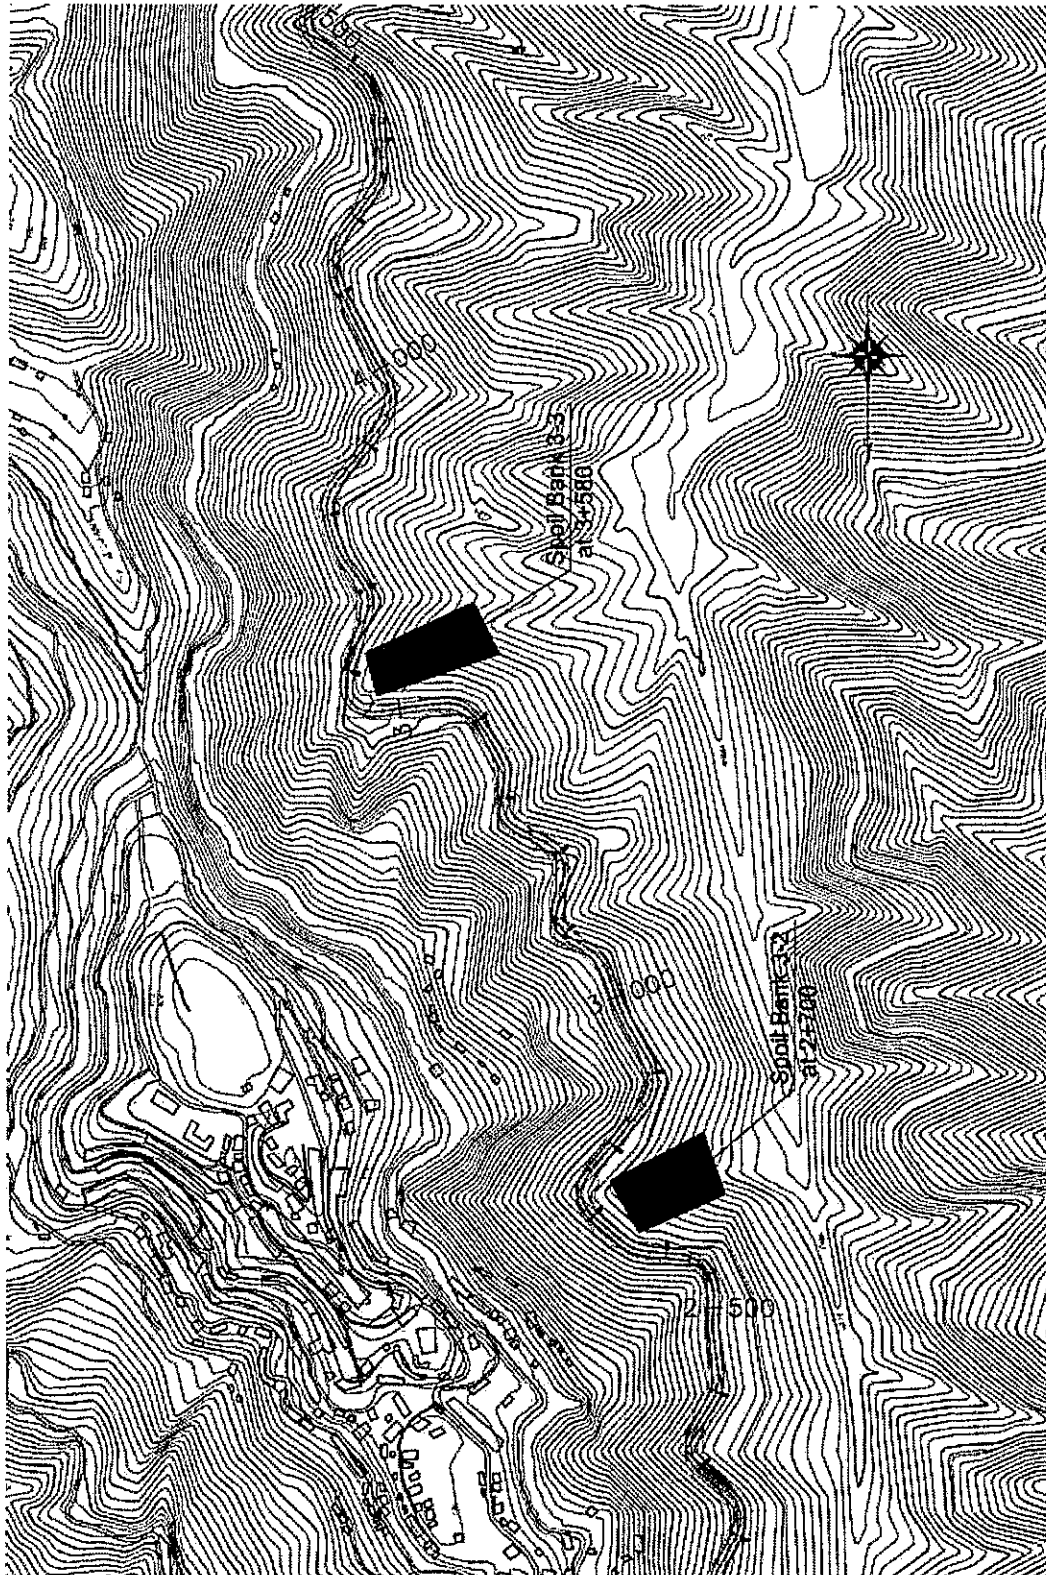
Plan for Locations of Spoil Bank (Serchhip Bypass) -4/4
